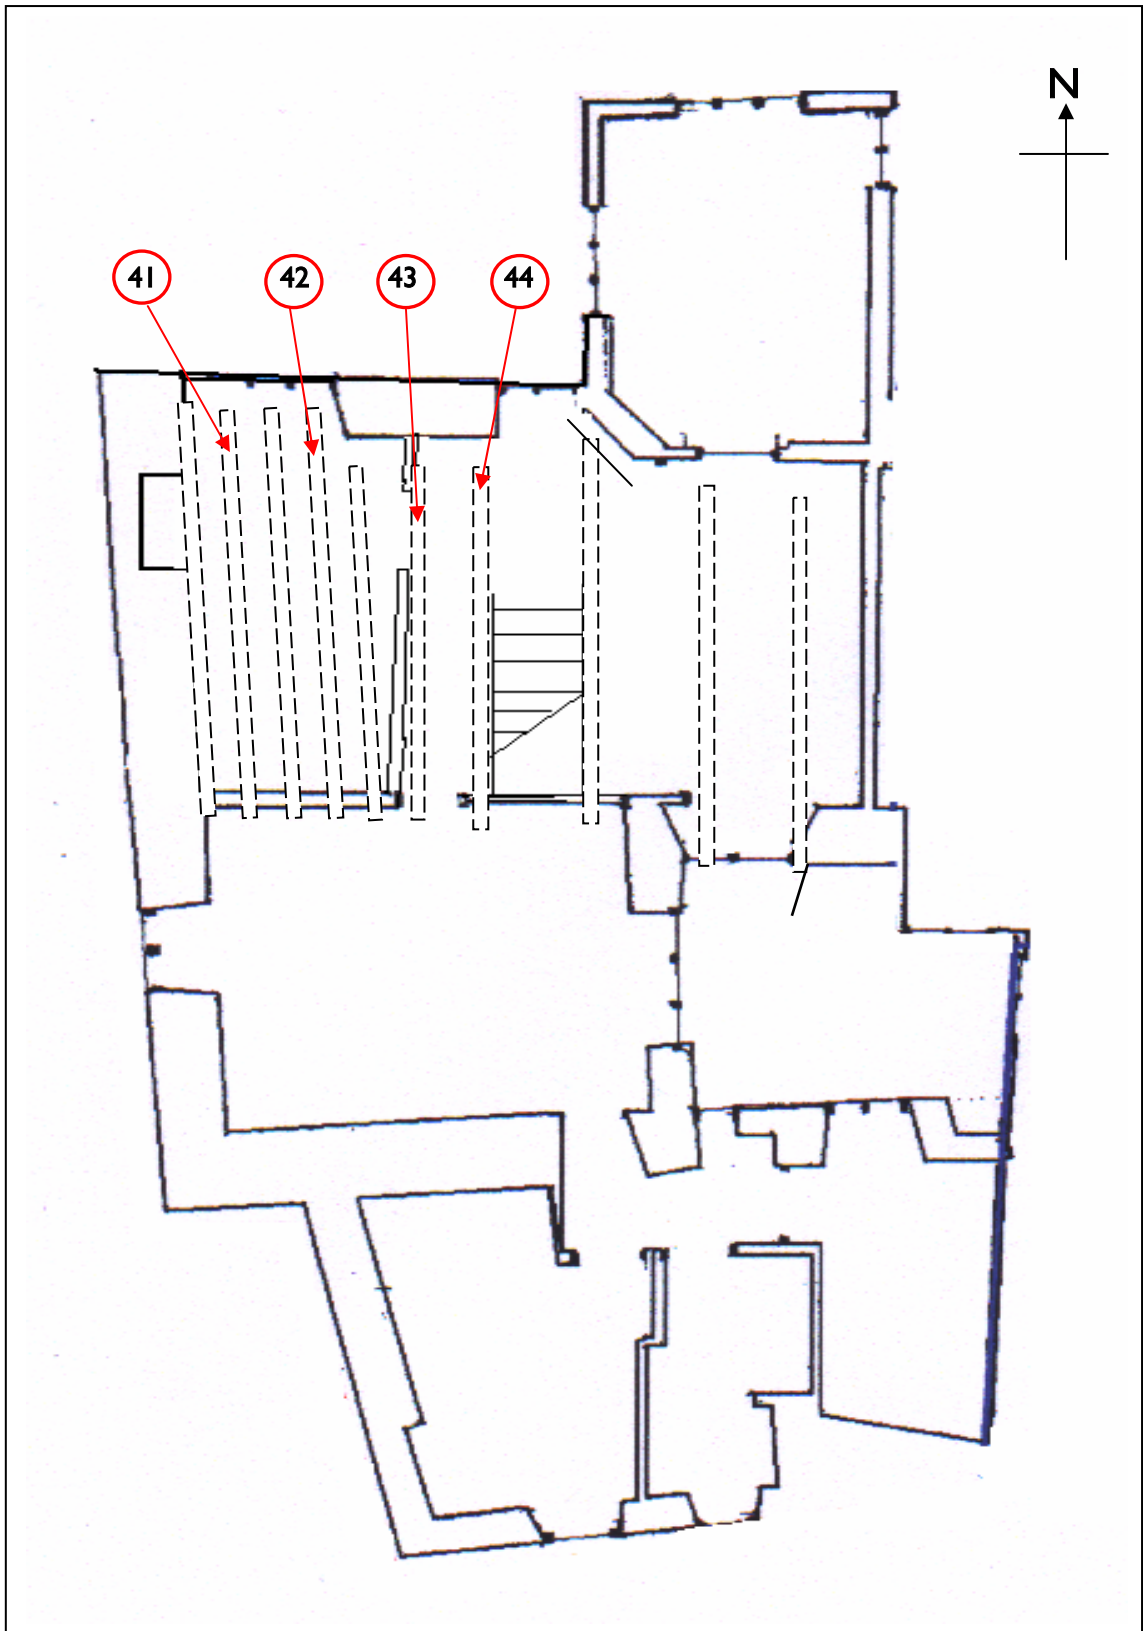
Plan show samples from the ground-floor ceiling beams of Keigwin (after Eric Berry and Nicholas Cahill)
